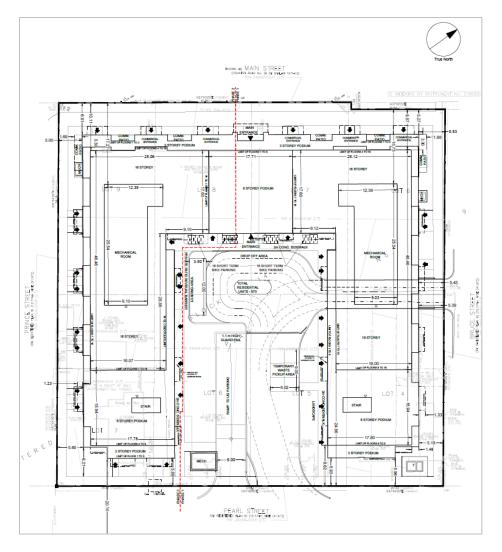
Conceptual Site Plan prepared by Arcadis – the dotted red line illustrates the anticipated phase limits between Phase 1 and 2
